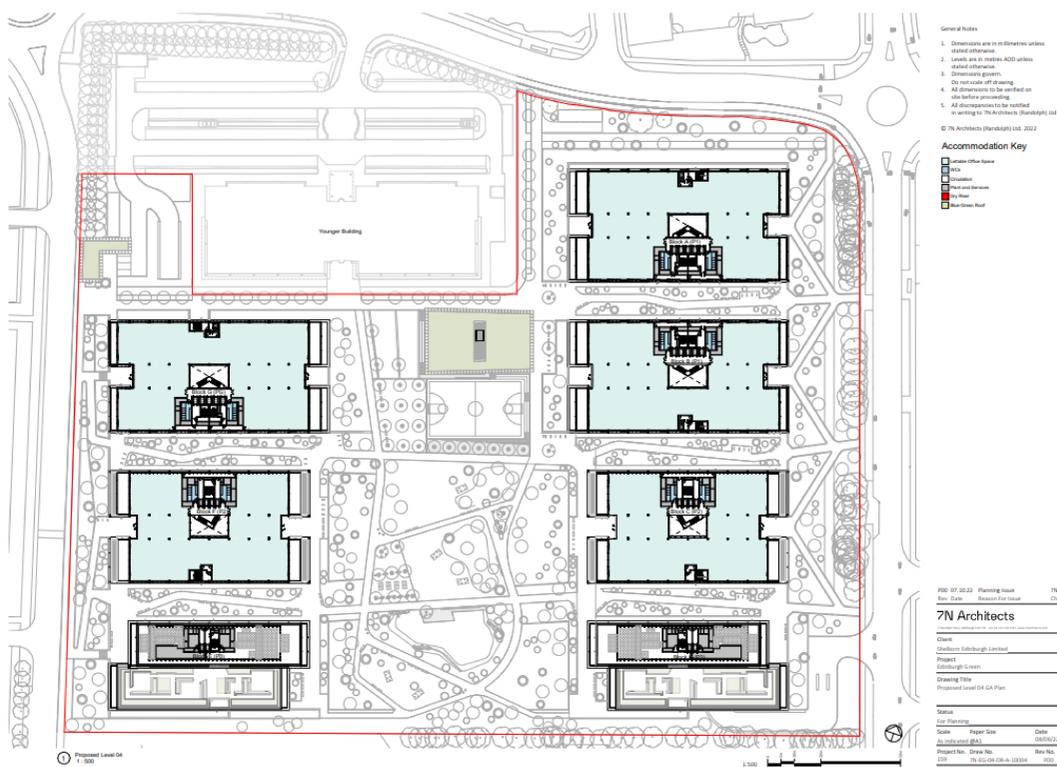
Proposed Site Layout Plan for Extant Scheme : Source: Planning Application 22/05659/FUL 7N Architects—City of Edinburgh Council Planning Portal.
